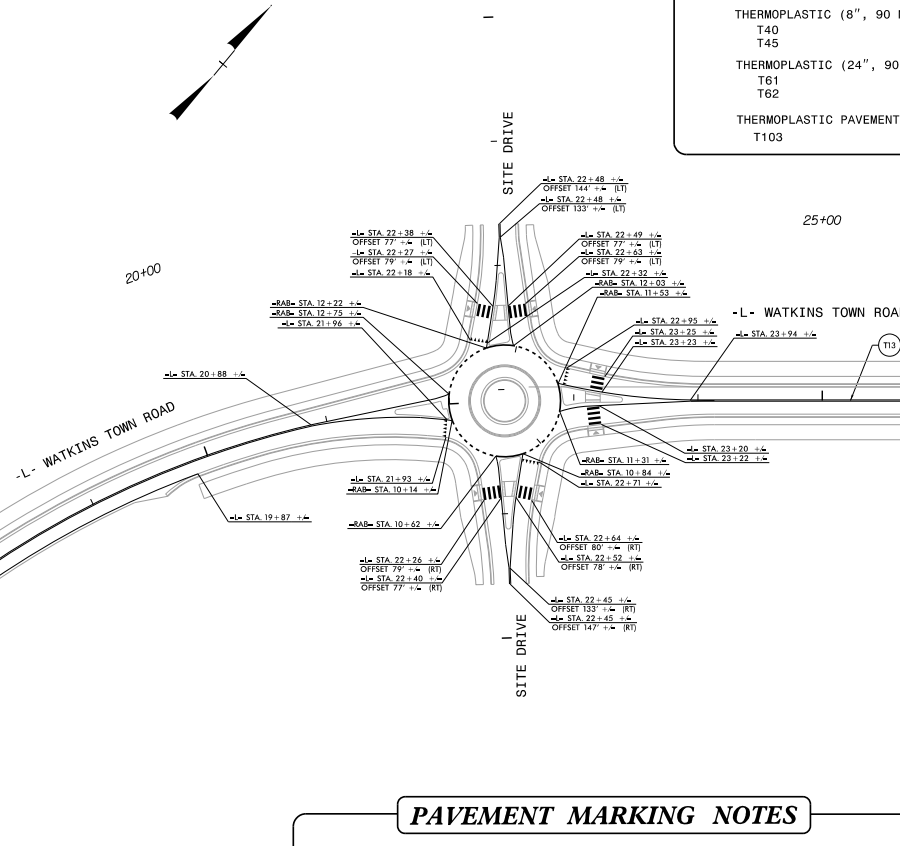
# EXHIBIT A: ROUNDABOUT PAVEMENT MARKING CALLOUTS
